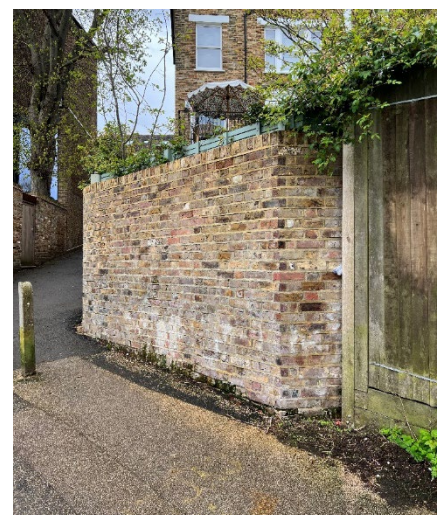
Existing boundary wall to 94 SHP and boundary fence
